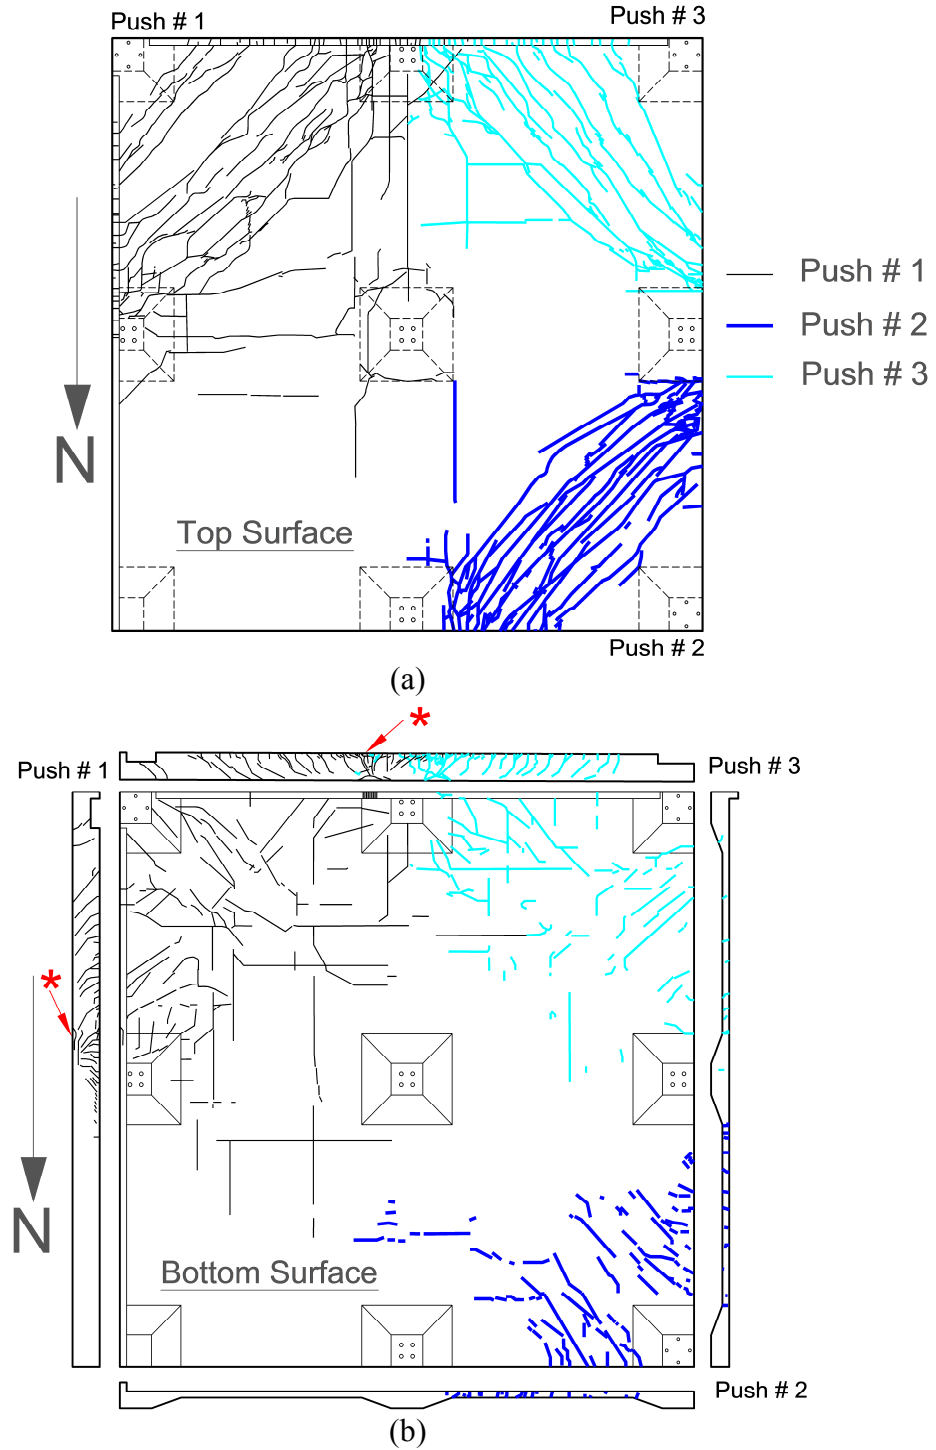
Cracking on the specimen at the end of tests on specimen 1, (a) cracks on the top surface, and (b) cracks on the bottom surface and edges. \*are the location of compressive failure shown in Figure 3.24.
